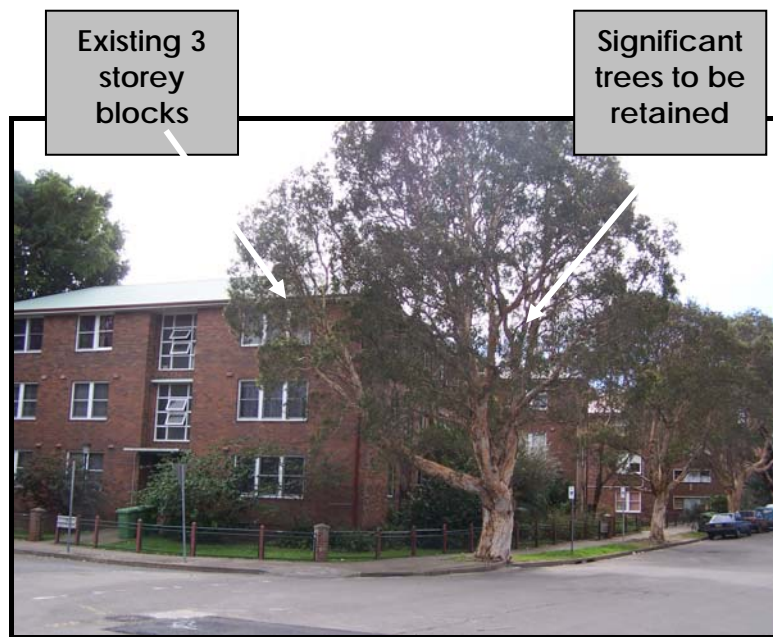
Subject site as viewed from opposite side of Phillip Street looking north.
